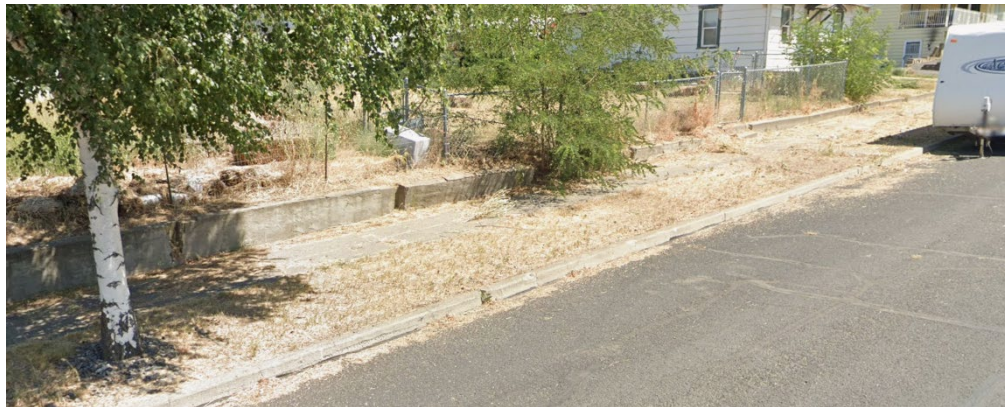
Sidewalk Obstruction on Palouse Street at 2nd Avenue
